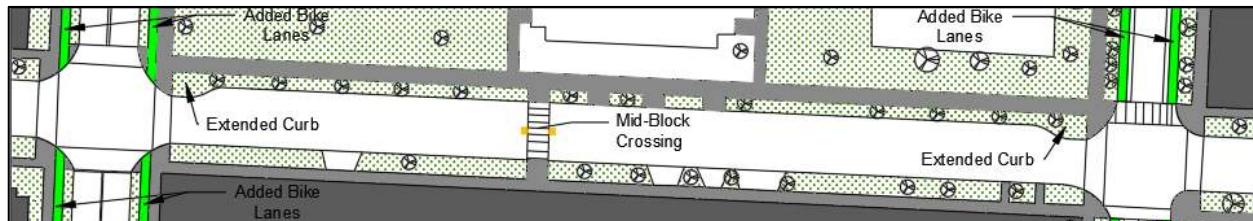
Mid-Block Crossing and Curb Extensions at Connaught School
